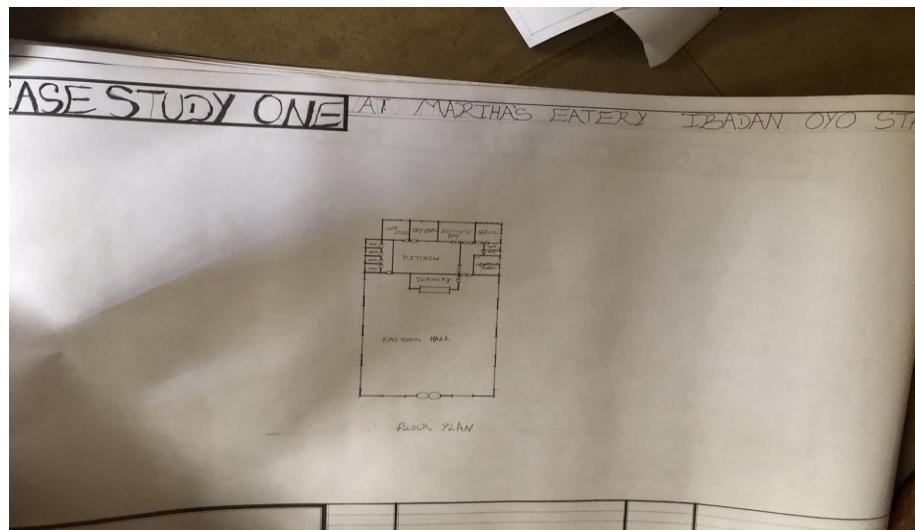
FLOOR PLAN OF CASE STUDY
